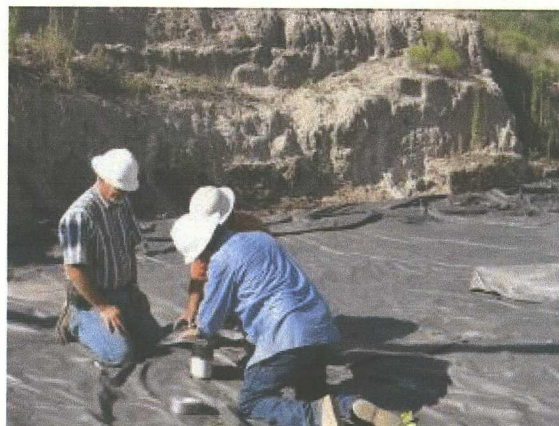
Sealing monitor well TMW-1 at the base of the excavation.
